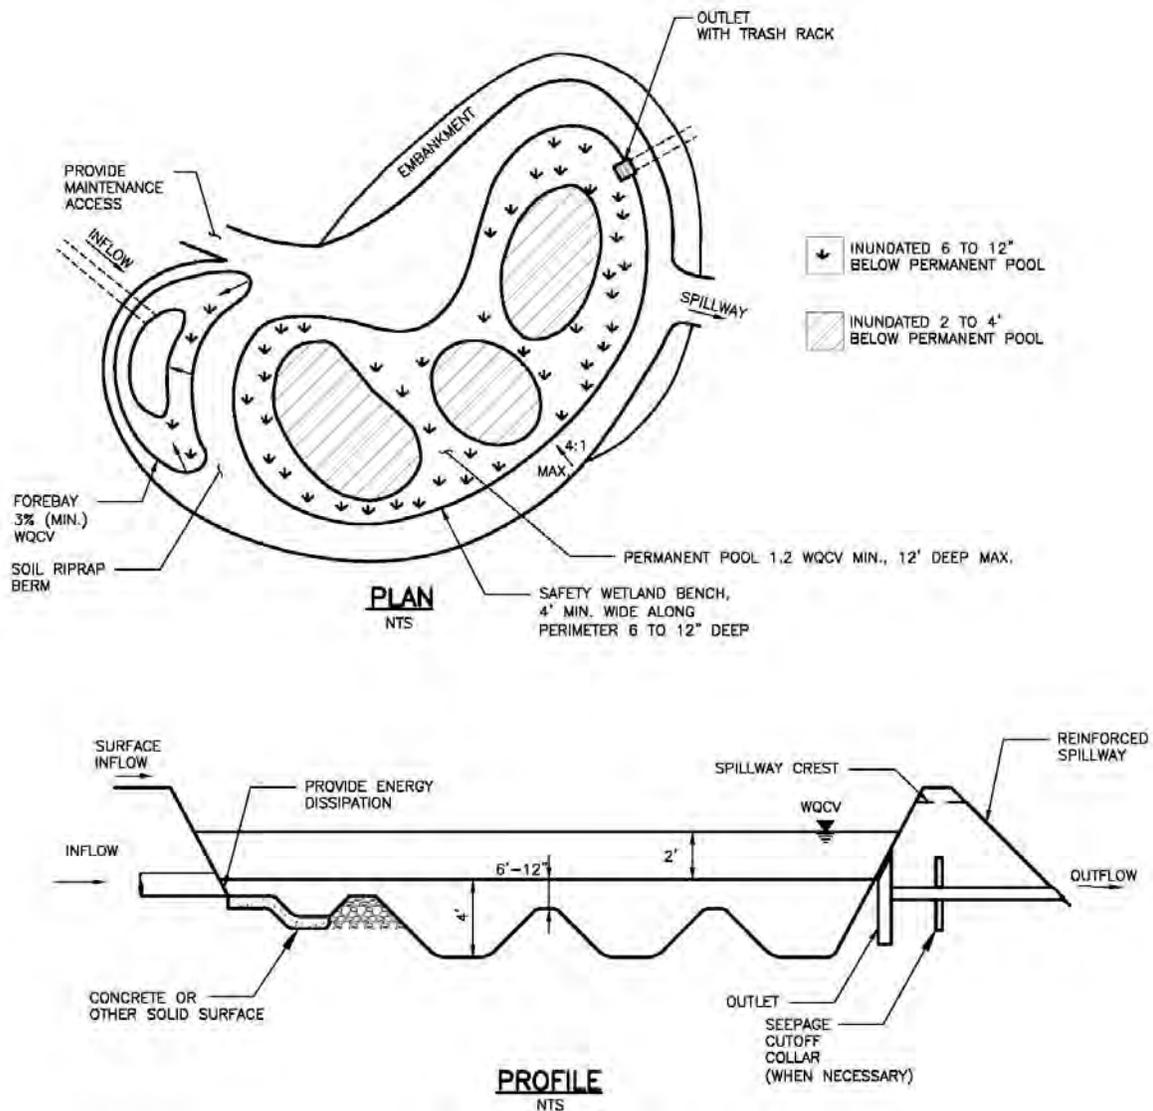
Constructed Wetland Pond – Plan and Cross-Section
